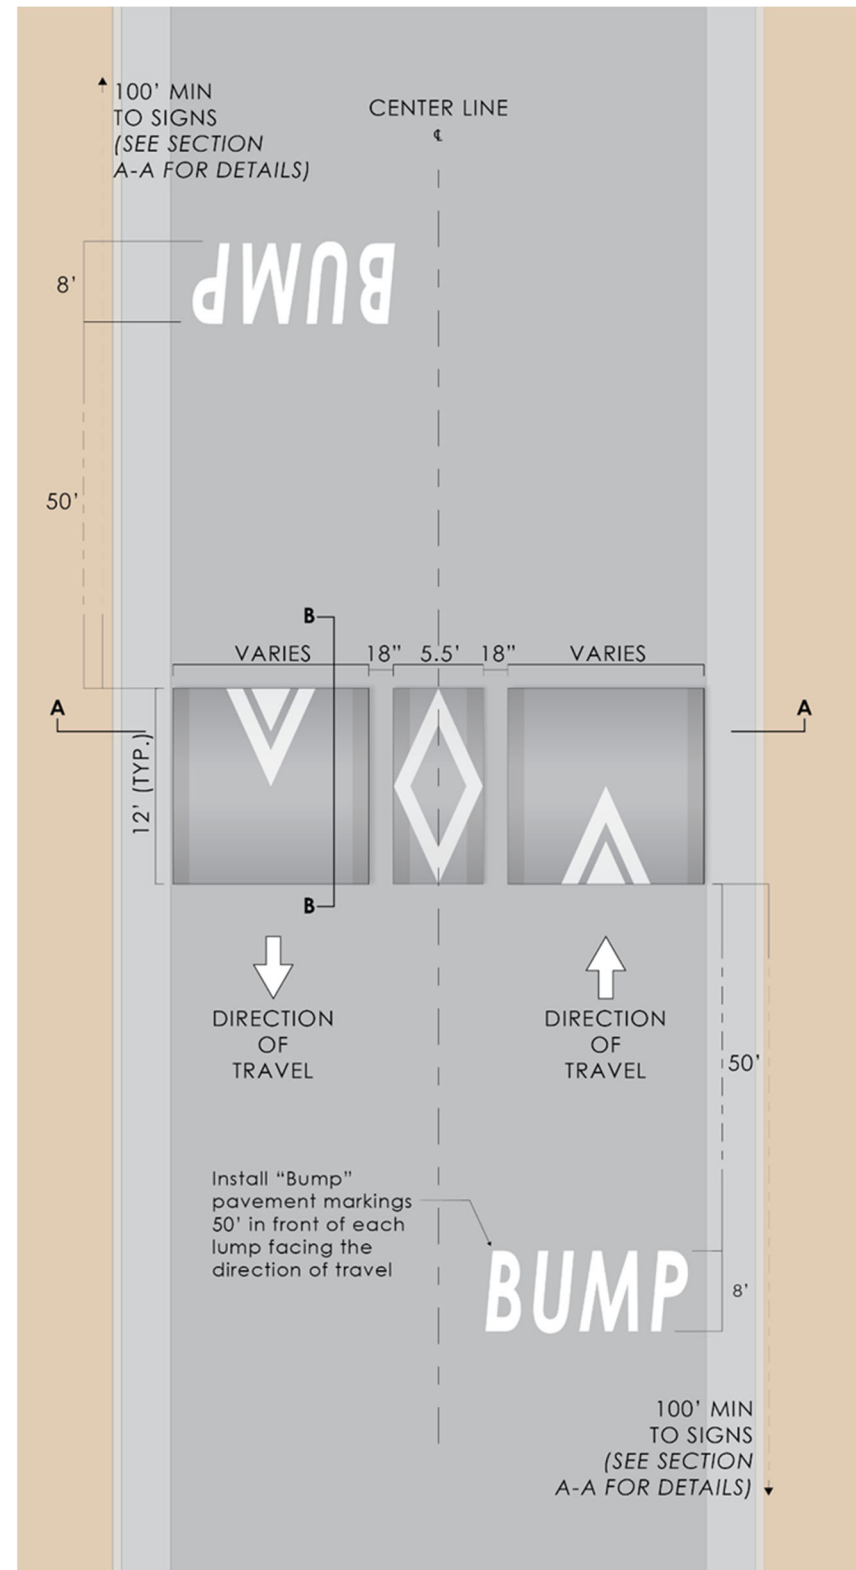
ROAD LUMPS PLAN VIEW
